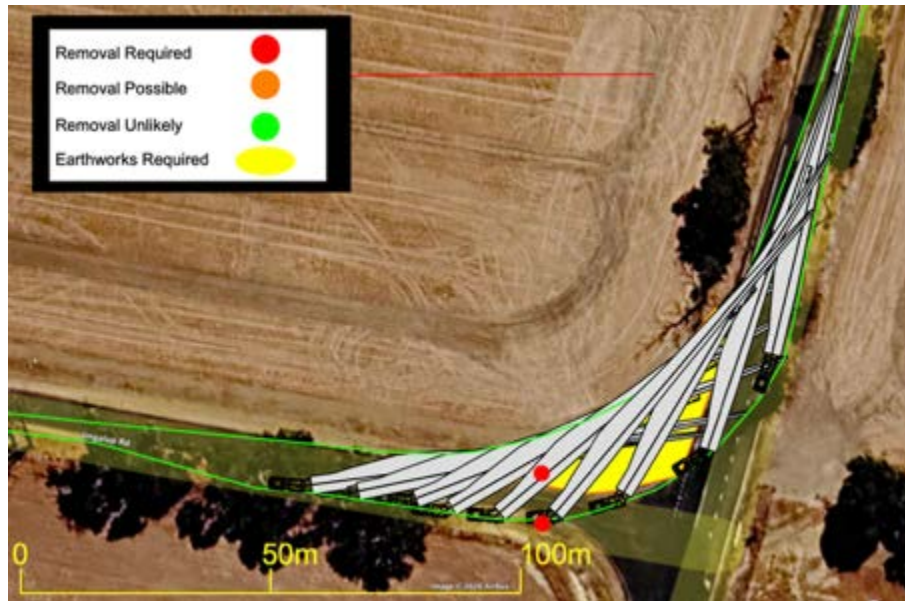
Shamrock Road Intersection (Looking South West to Jingalup Road)
